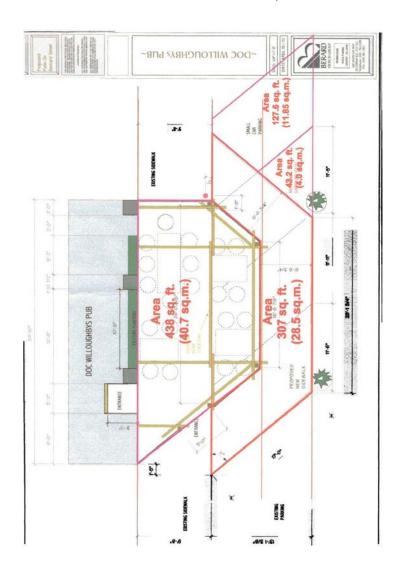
TYPICAL OUTDOOR SEATING LAYOUT
